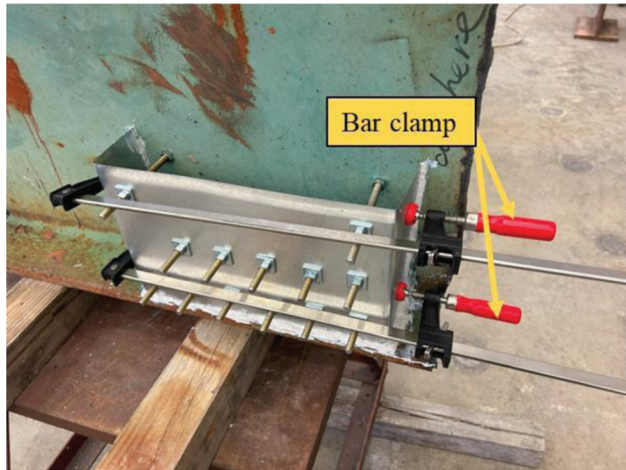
Sandwich panel repair mock-up specimen. Clamped stay-in-place formwork.
